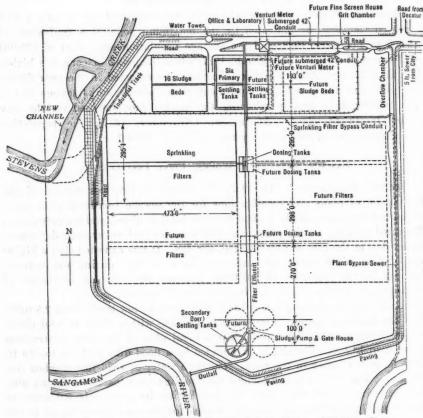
GENERAL PLAN, SEWAGE TREATMENT PLANT, DECATUR, ILL.
